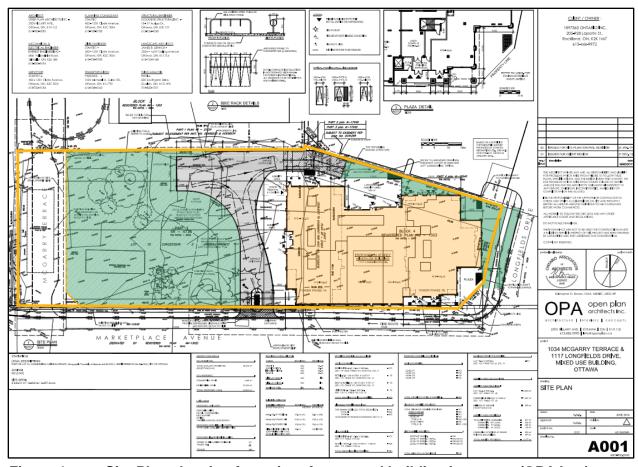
Site Plan showing footprint of proposed building in orange (OPA Inc.).
